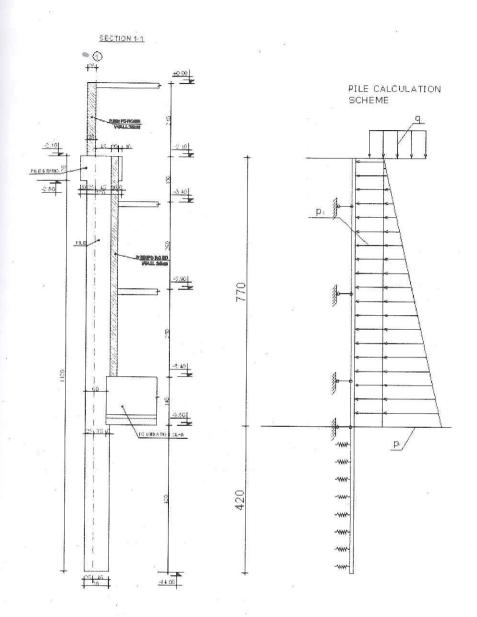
Elevation after the construction of the three story underground, Calculation scheme in this phase.
